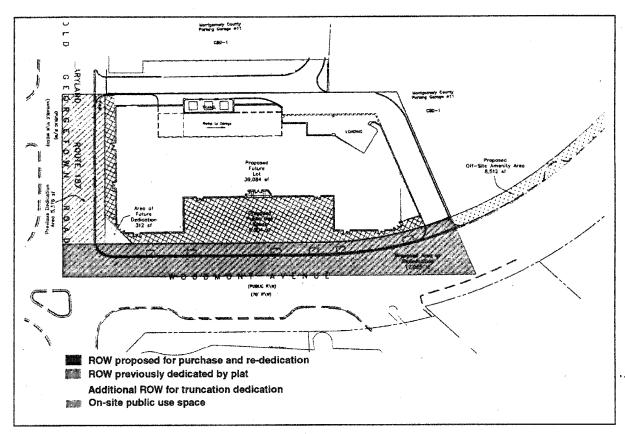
Building and road frontages for Woodmont Corner. The red area shows the Woodmont Avenue ROW proposed for purchase and immediate re-dedication.
